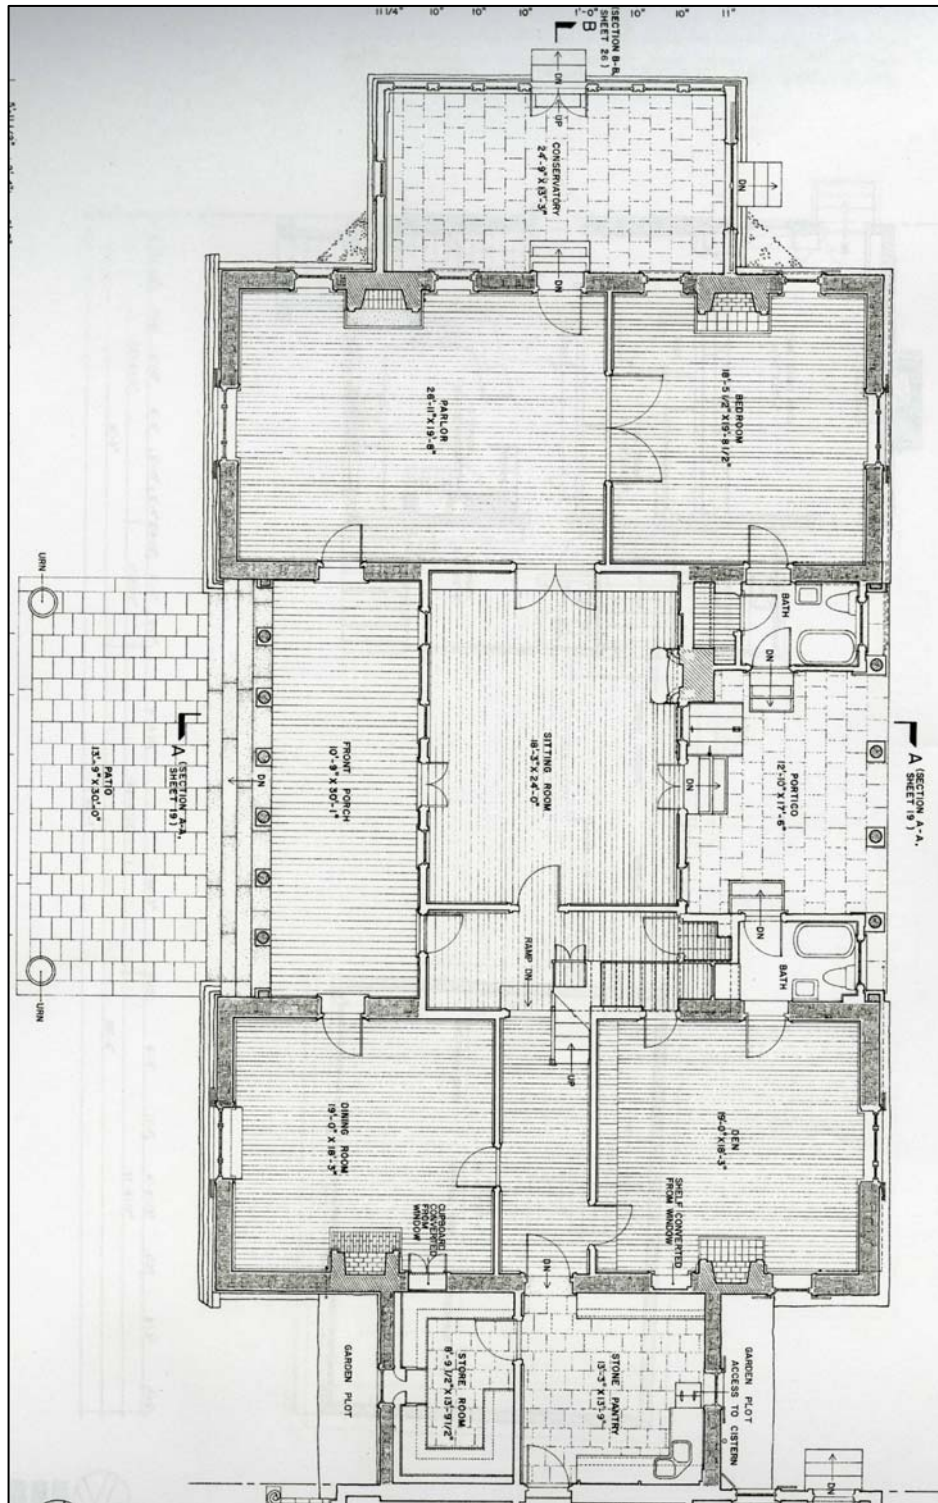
The first floor plan of the Borough House as drawn for HABS. The two wings with darker outlines are built of pisé. The central potrion and the conservatory on the top are built of wood frame. (Image: Library of Congress)
